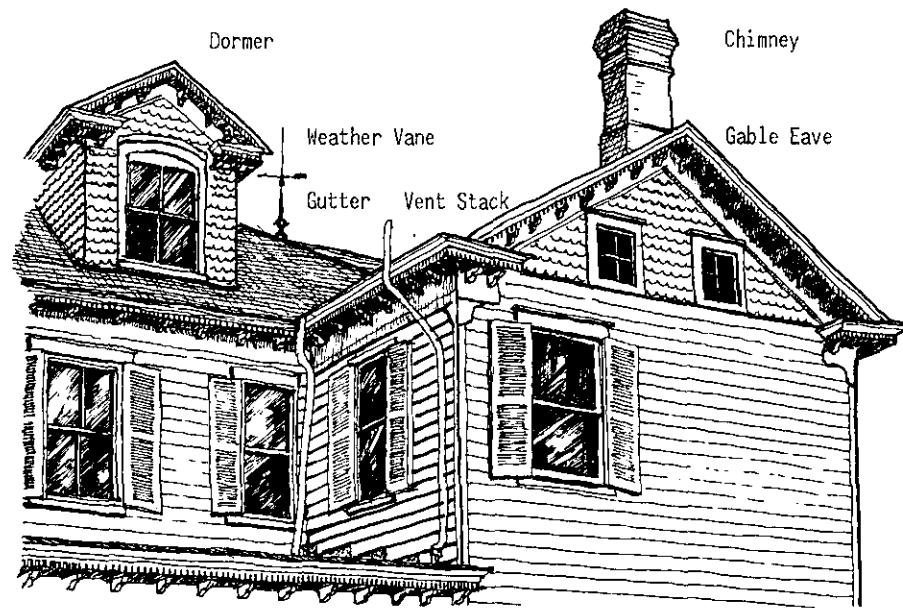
Projecting Roof Elements (note that gutter and stack vent pipe might be more sensitively positioned)
